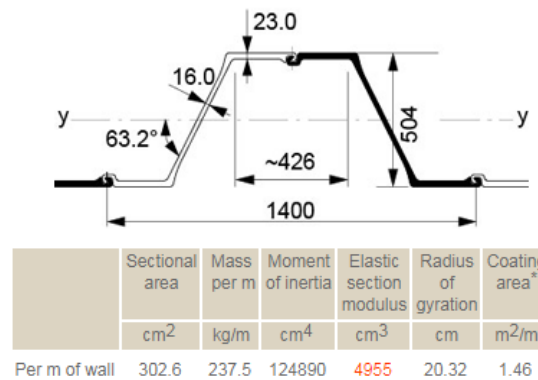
Dimensions and characteristics of the sheet pile wall Anchelor profile AZ 50-700 (ArcelorMittal)
